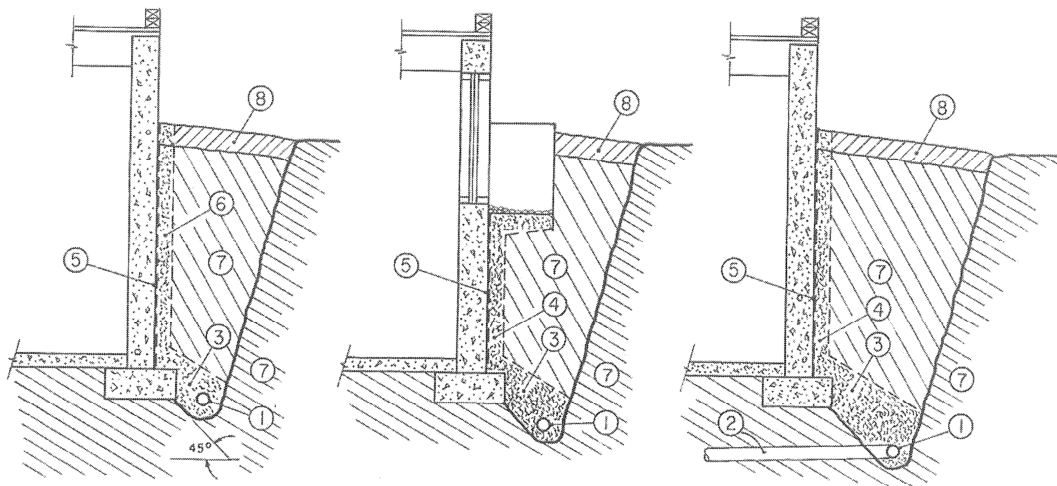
Typical Sections Showing Arrangement of Subsurface Perimeter Drains around Shallow Foundations
